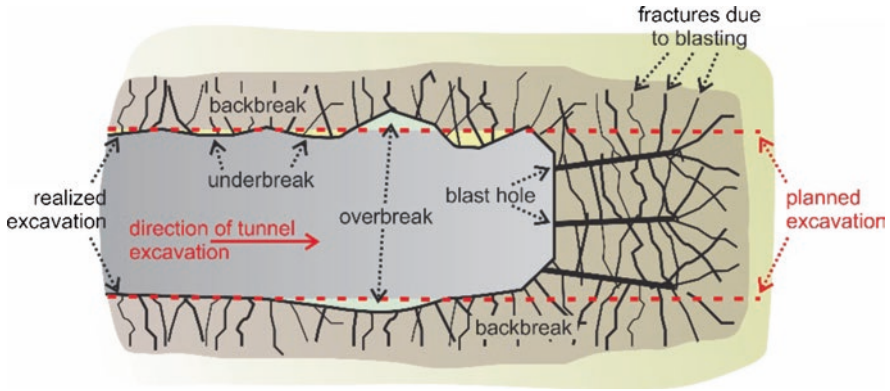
Discontinuities in a groundmass due to blasting and present as backbreak in the walls, roof, and floor of a tunnel
